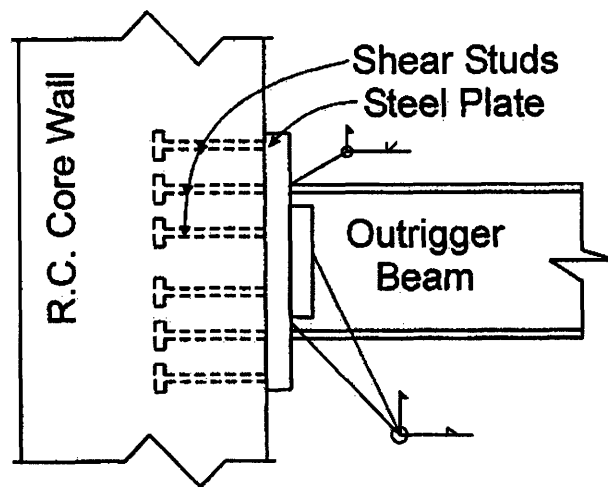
Outrigger beam – core wall moment connection (Shahrooz, 2004)
